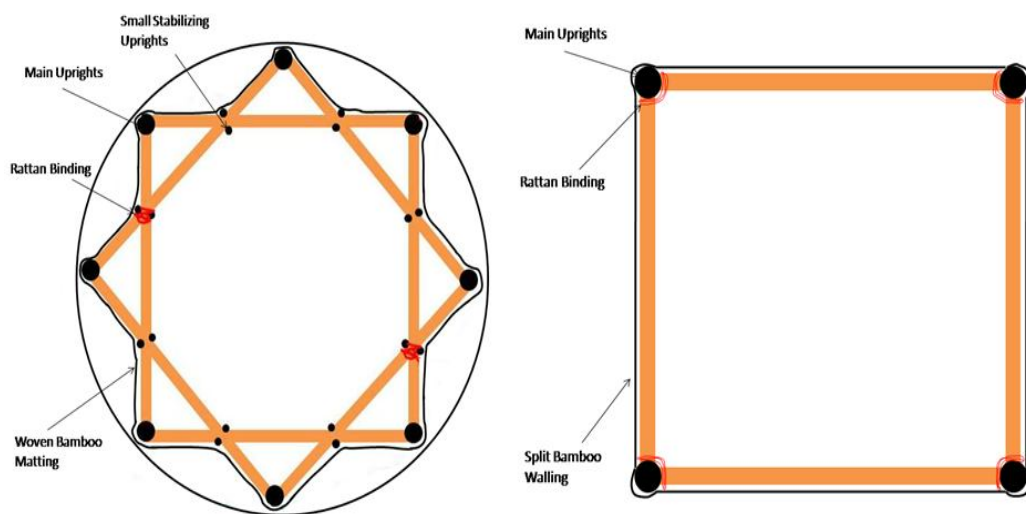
Plan View (Schematic) of Khanong A2 Mining Shaft Wooden Structures (Left) and the Square Shafts Found at Tengkham South D (Right) (Diagram: A. Tucci).
